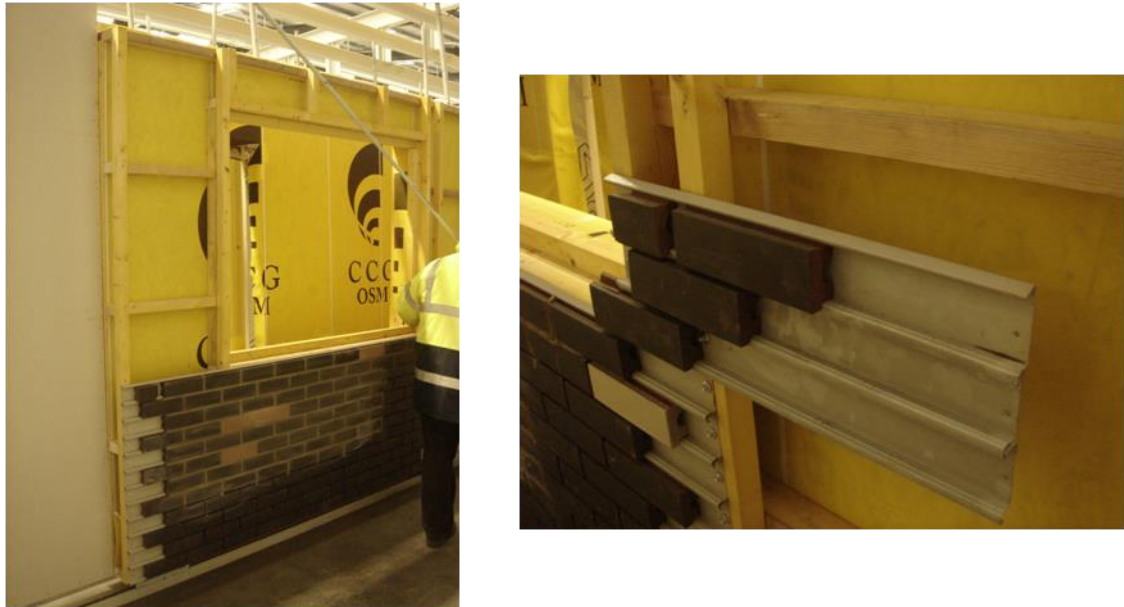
Cladding system mimicking brick facades, developed for timber-frame housing by CCG (OSM) Ltd, Glasgow.
